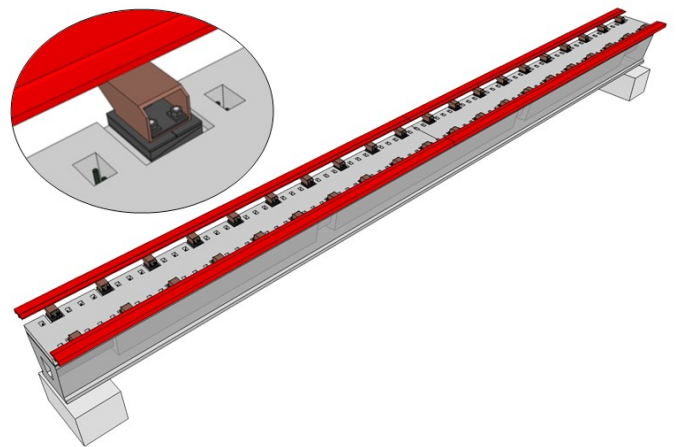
Conceptual drawing of PSC-U type guideway girder system
